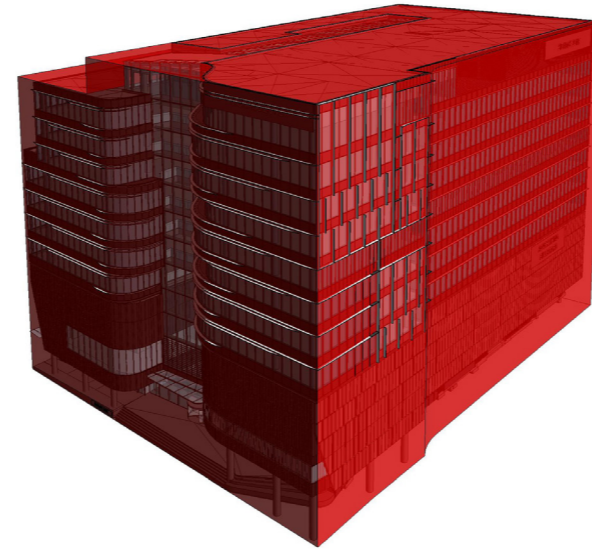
Parameter Plan envelope overlay. Aerial view at north east corner.
